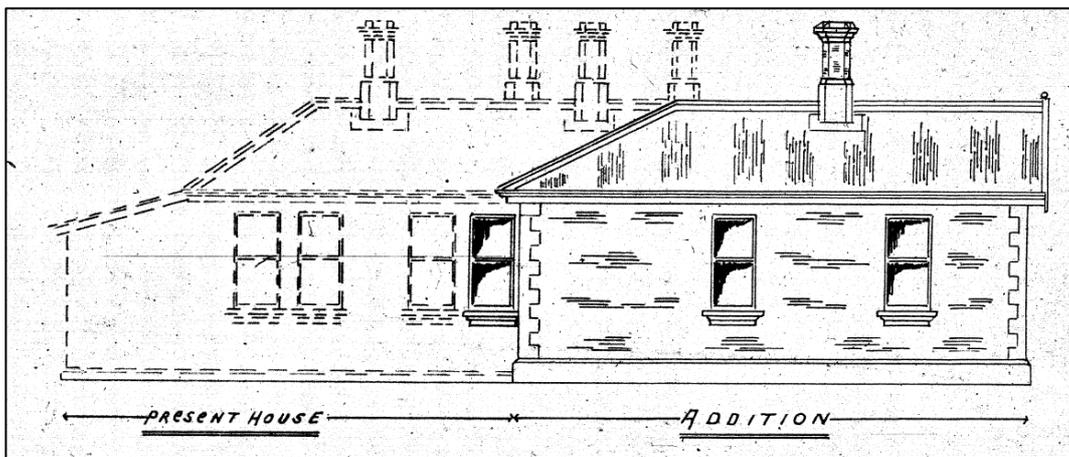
1929 Proposed addition, west elevation (Building Plans, DCC Archives).
